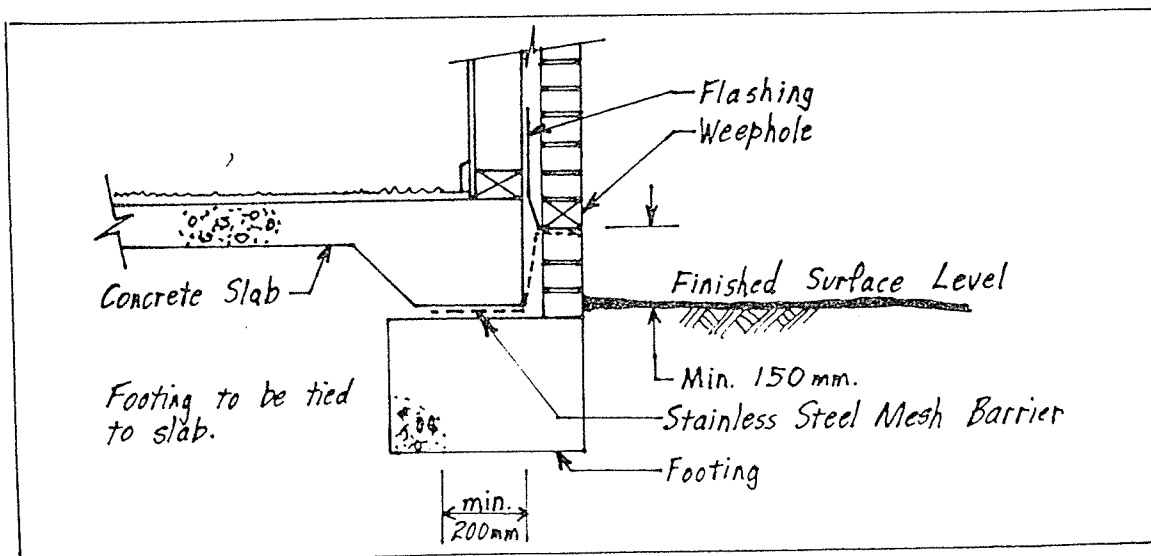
SLAB EDGE DETAIL - Steel Mesh Barrier.
